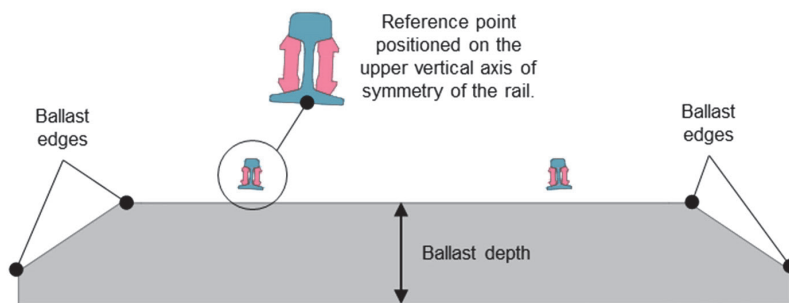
Parametric cross-section implemented in the Subassembly Composer, showing nominal geometric dimensions
